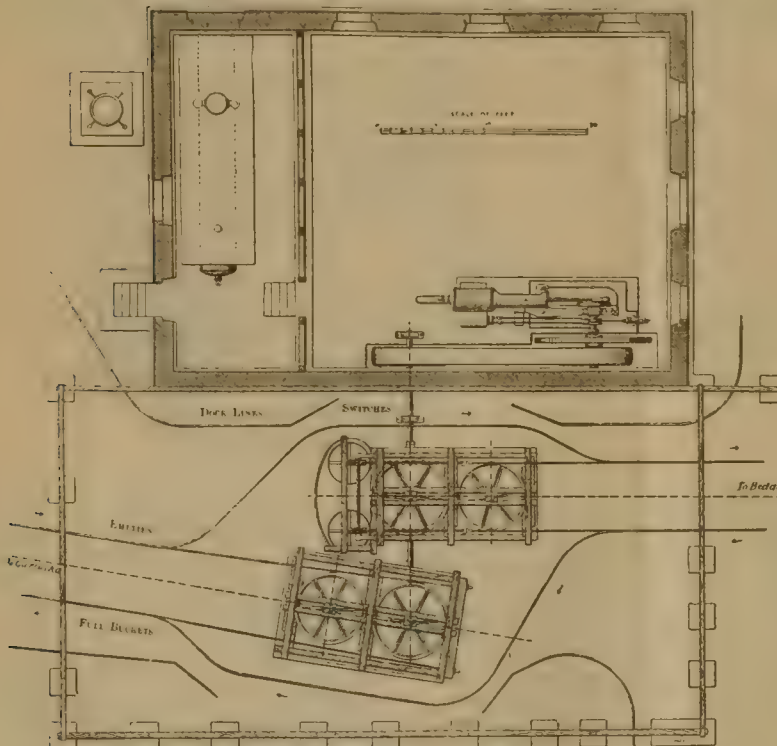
SECTIONAL PLAN OF ANGLE STATION.
